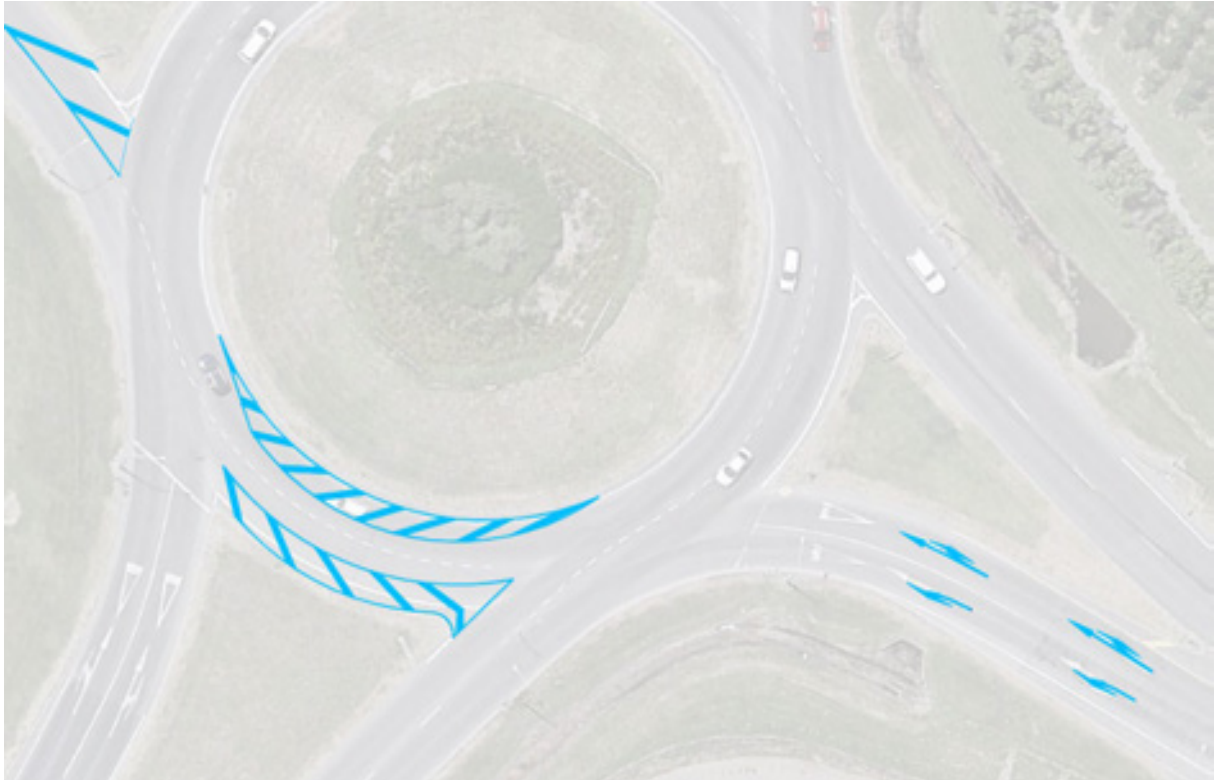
Proposed Layout of Evenden Road and Site Access
